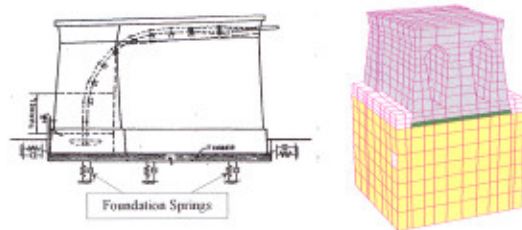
Elevation and computer model of the Manhattan cable anchorage.
